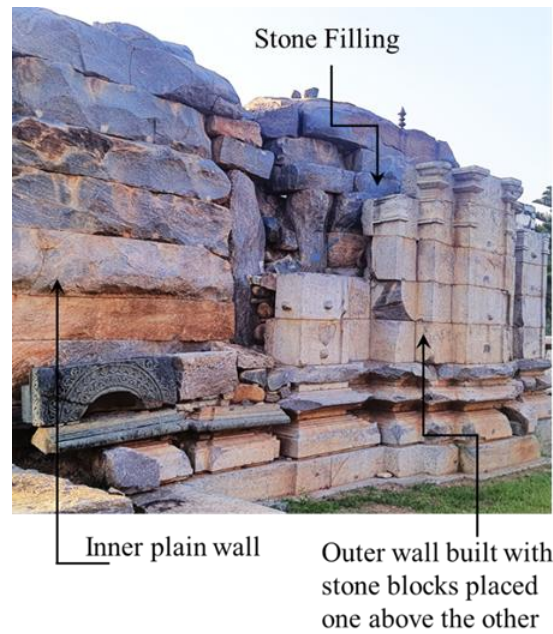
Wall detail of Kalyana Cālukyan Temple.
